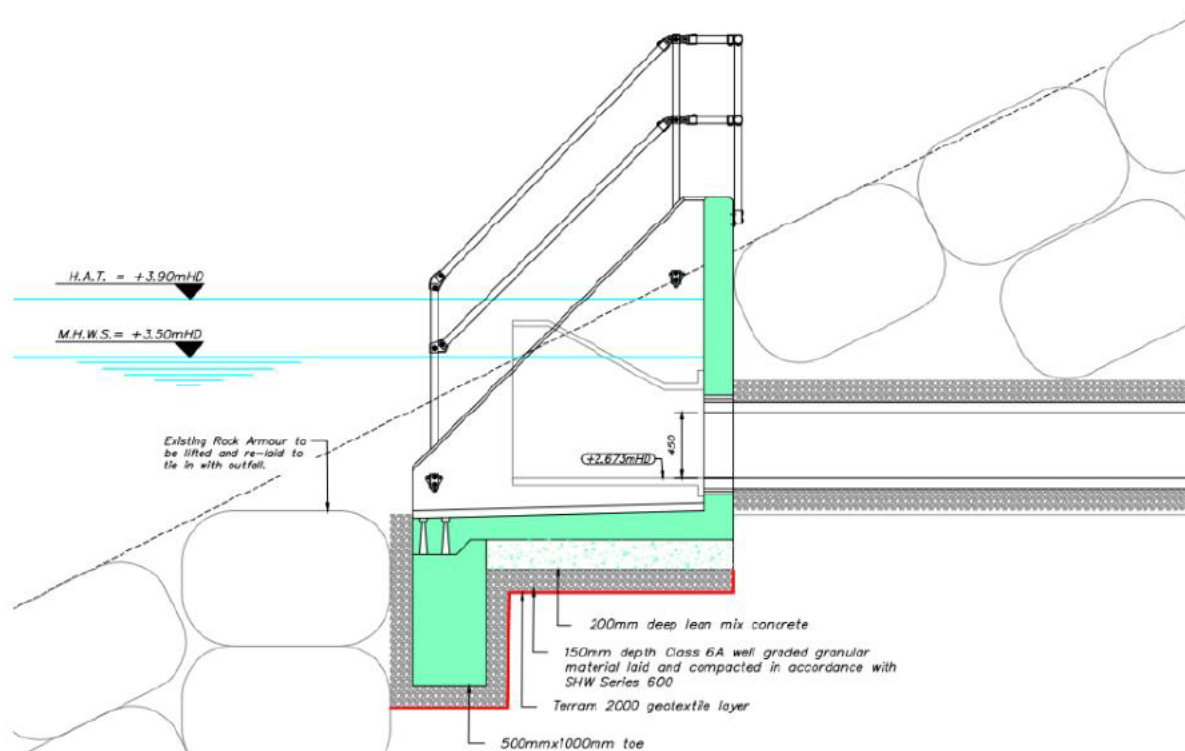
Cross-section of outfall through quay wallFigure 2-2: Cross-section of outfall through revetment
